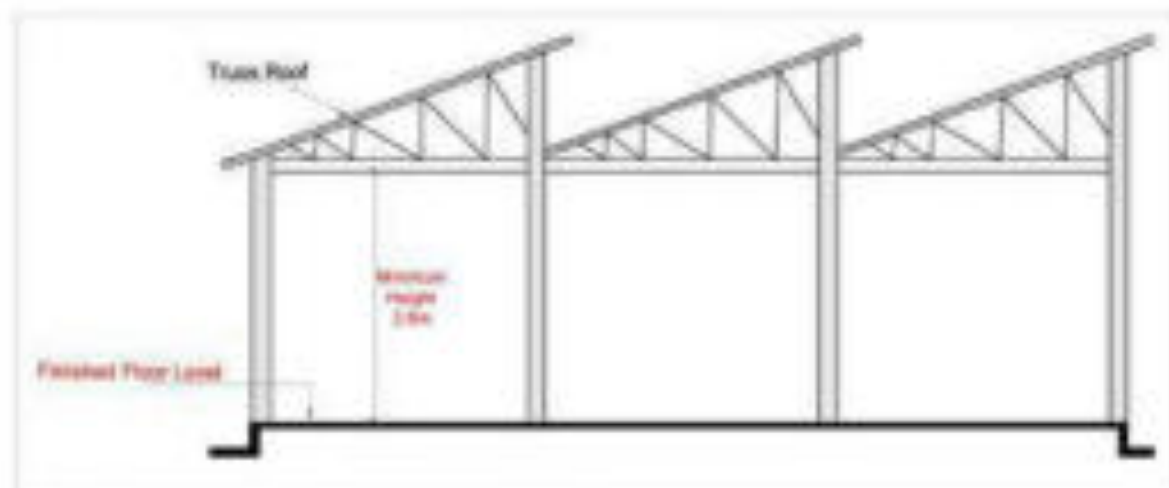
Minimum Clear Height for Trussed Roof
